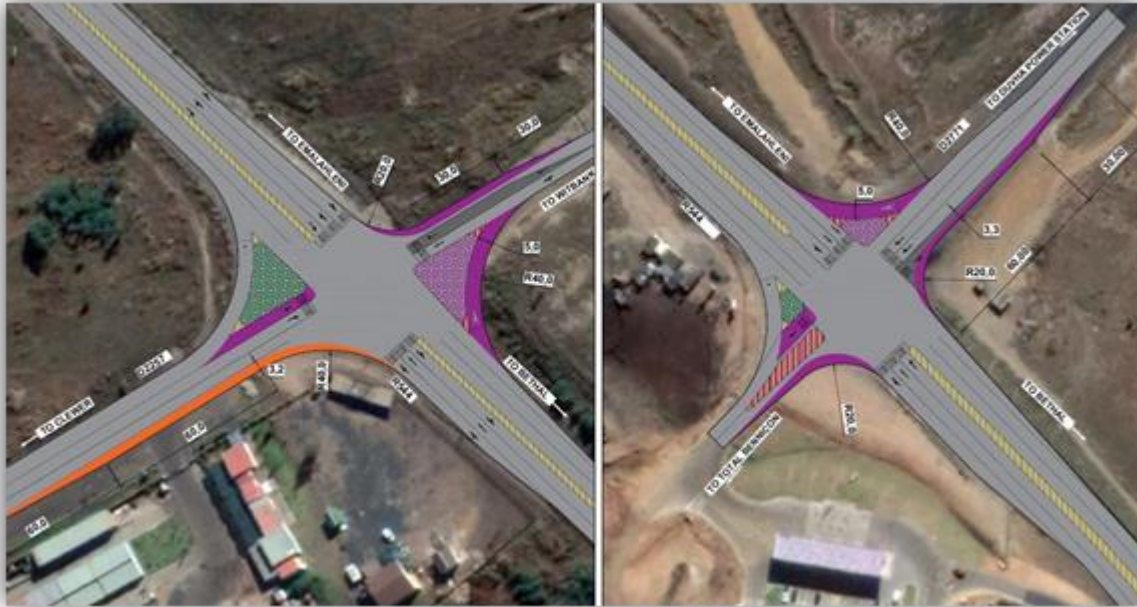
Surrounding Road Network (Korsman & Associates, 2021).
